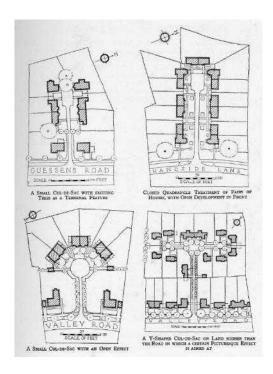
Street layout plan illustrating types of cul-de-sac taken from The Building of Satellite Towns by C.B. Purdom
